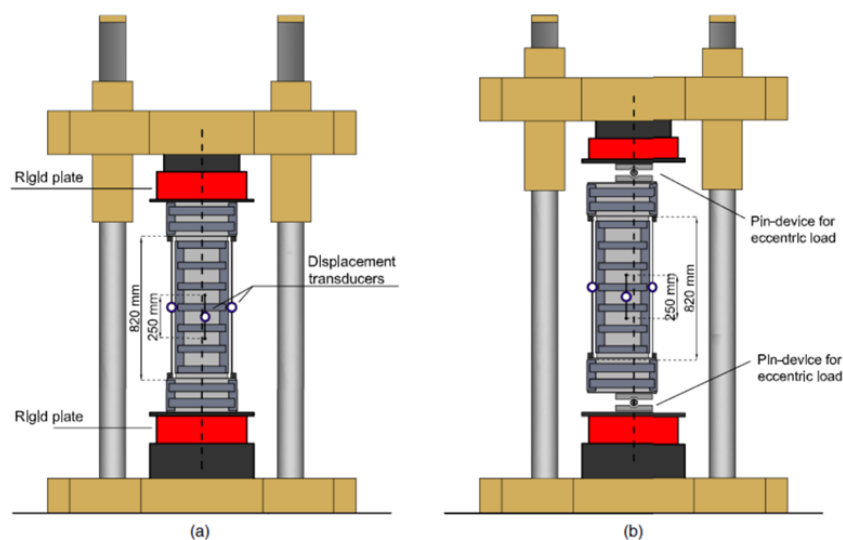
Test set up (a) axial compressive test (b) eccentric compressive test [35]
